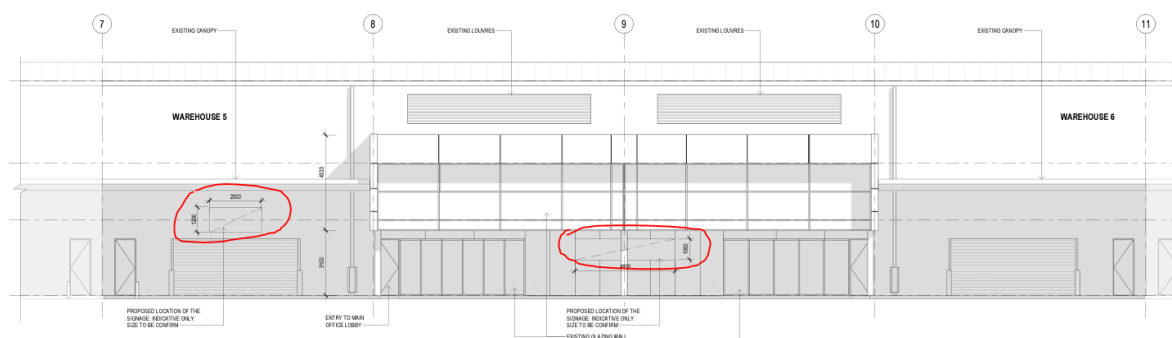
signage zone locations circled in red (source: applicant's architectural plans)
